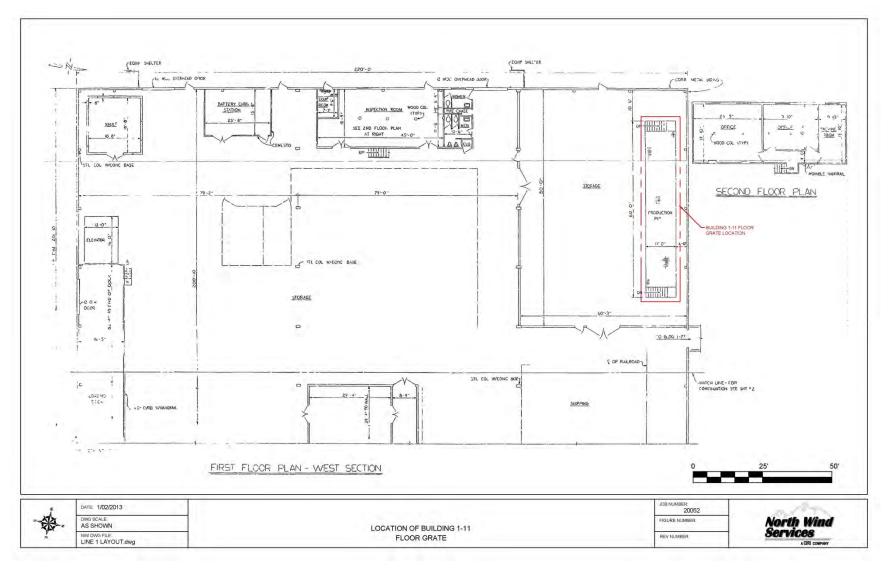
As-built floor plan for western portion of Building 1-11.
